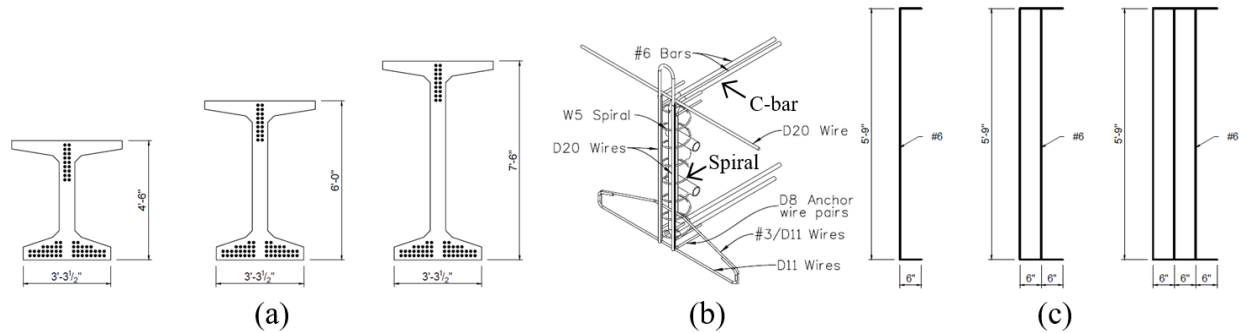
Benchmark girders: (a) dimension; (b) default reinforcement in end zone; (c) C-bar configuration
